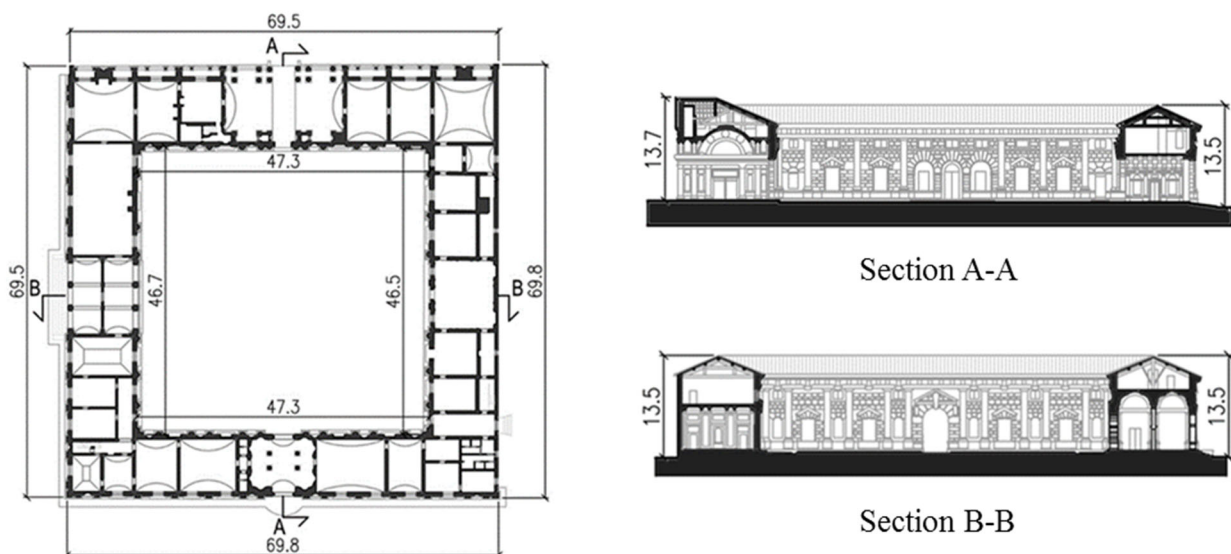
Palazzo Te: plan, two sections and indication of the main geometrical dimensions.
